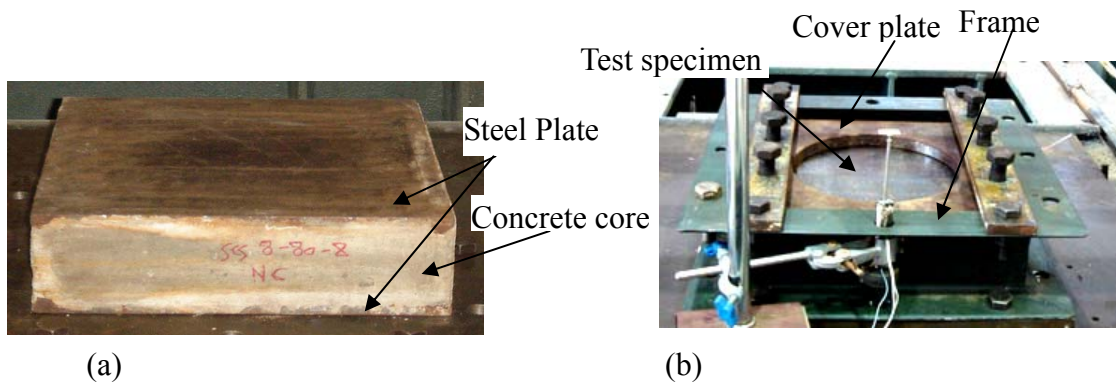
(a) Specimen for the investigation of local impact behaviour and (b) picture of the frame holding the specimen during impact.
